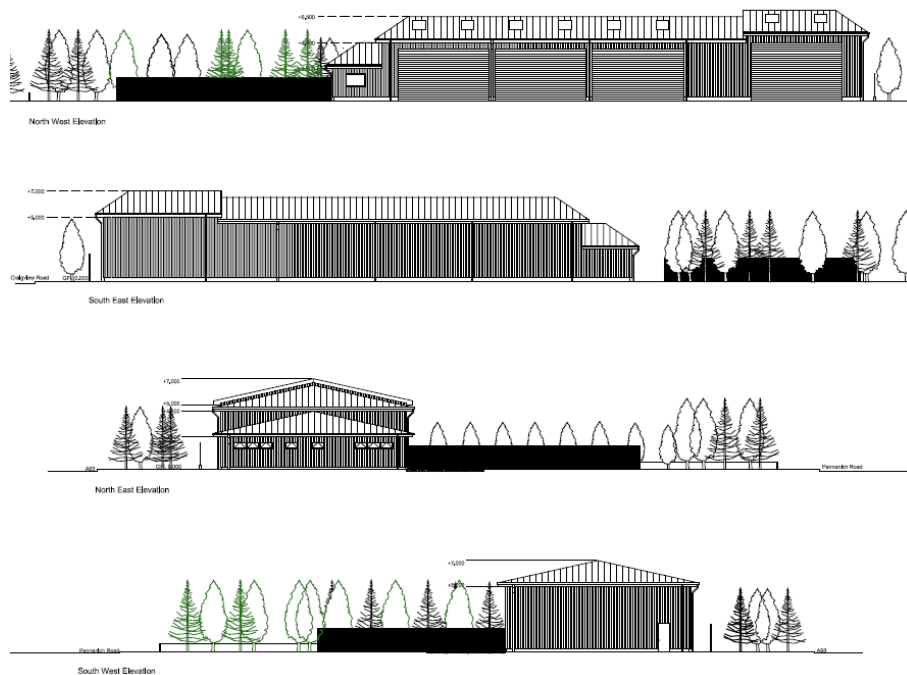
Elevations (Extract from Drawing No 40032-L-003 Rev D – for information only)
